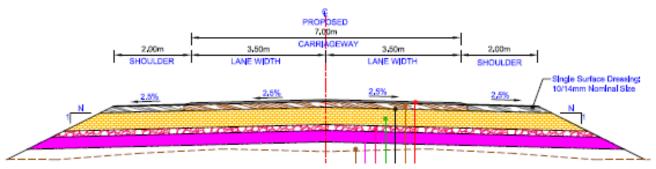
Single carriage cross-section until 2030 (proposed by detailed design)
